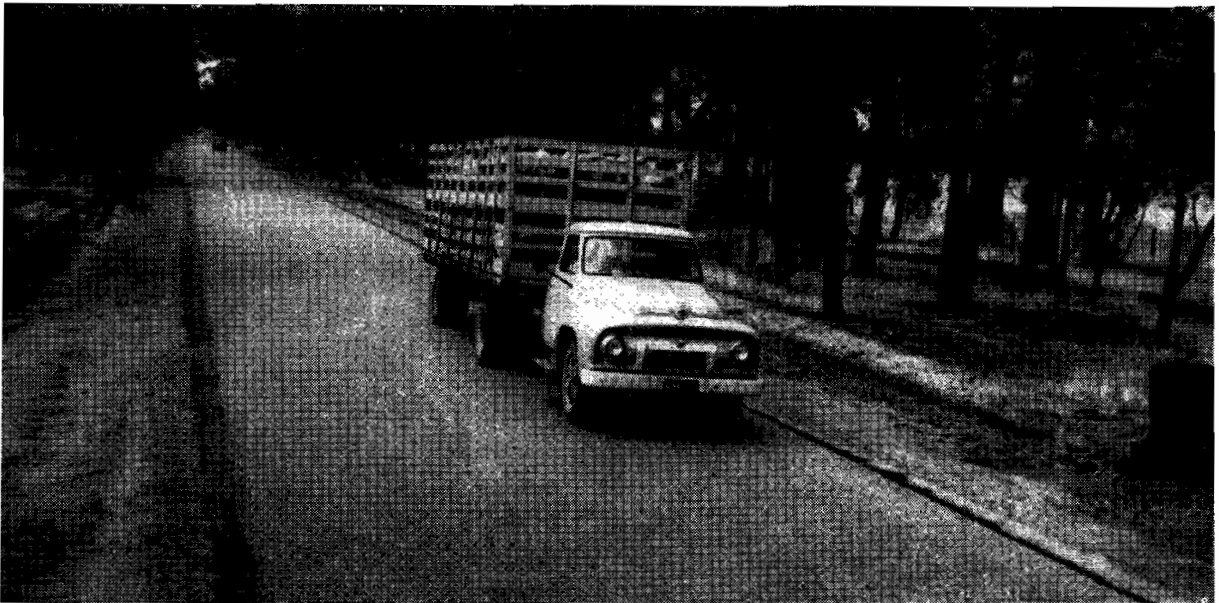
Reconstructed section of Midland Highway near Swanpool.
